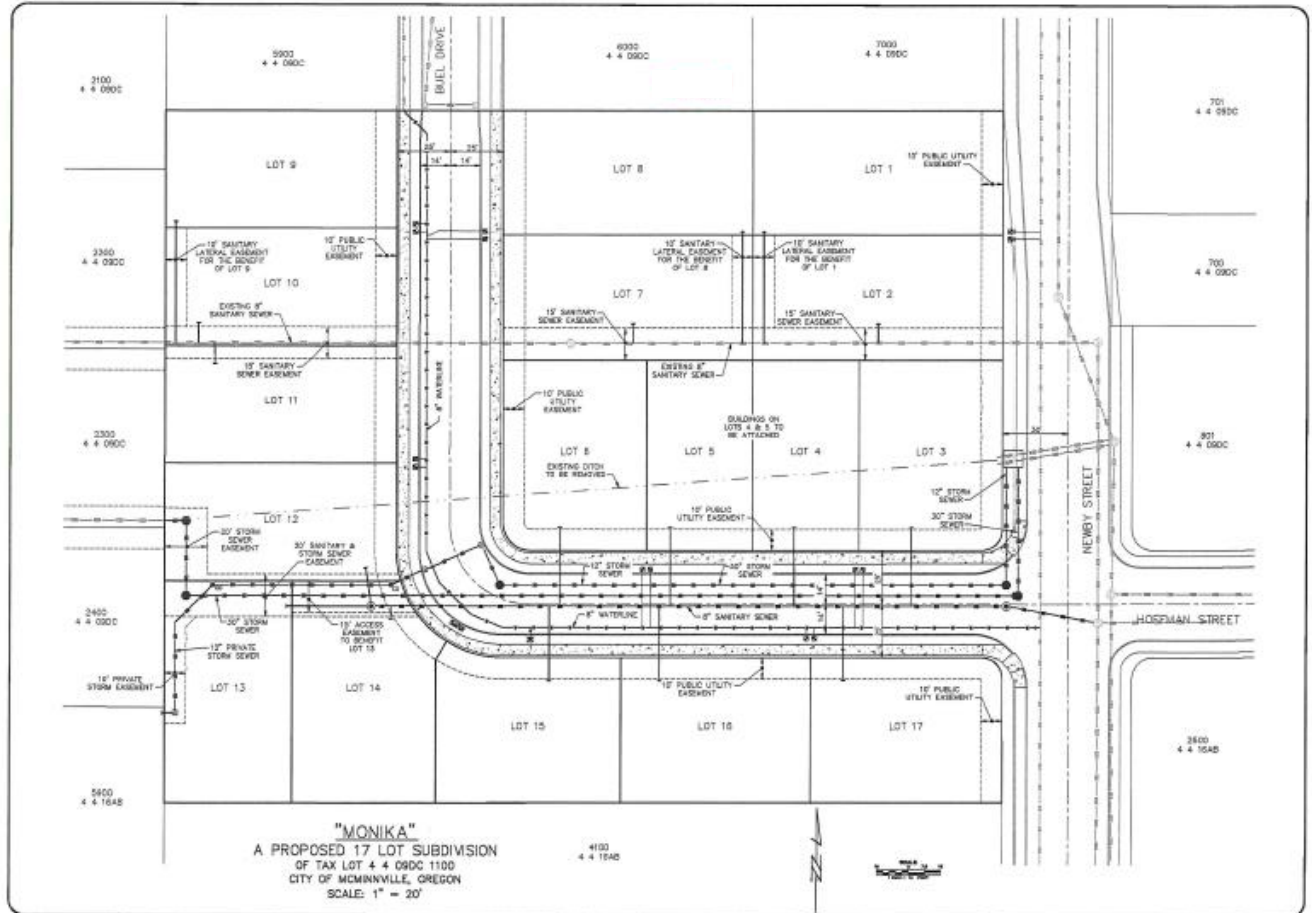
Proposed Subdivision Tentative Plan
